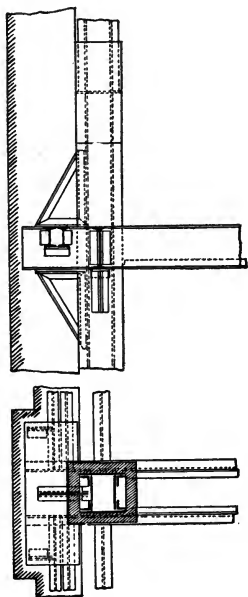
Detail of “Free-standing” Wall Columns. St. Paul Building.
